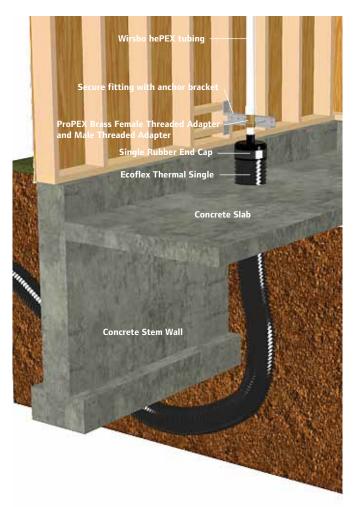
Slab-on-grade Under Footing Installation – Interior Wall Attachment
